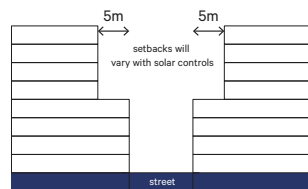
Diagram demonstrates the relationship between height, street wall height, boundary wall and building separation (6-8 storeys)
